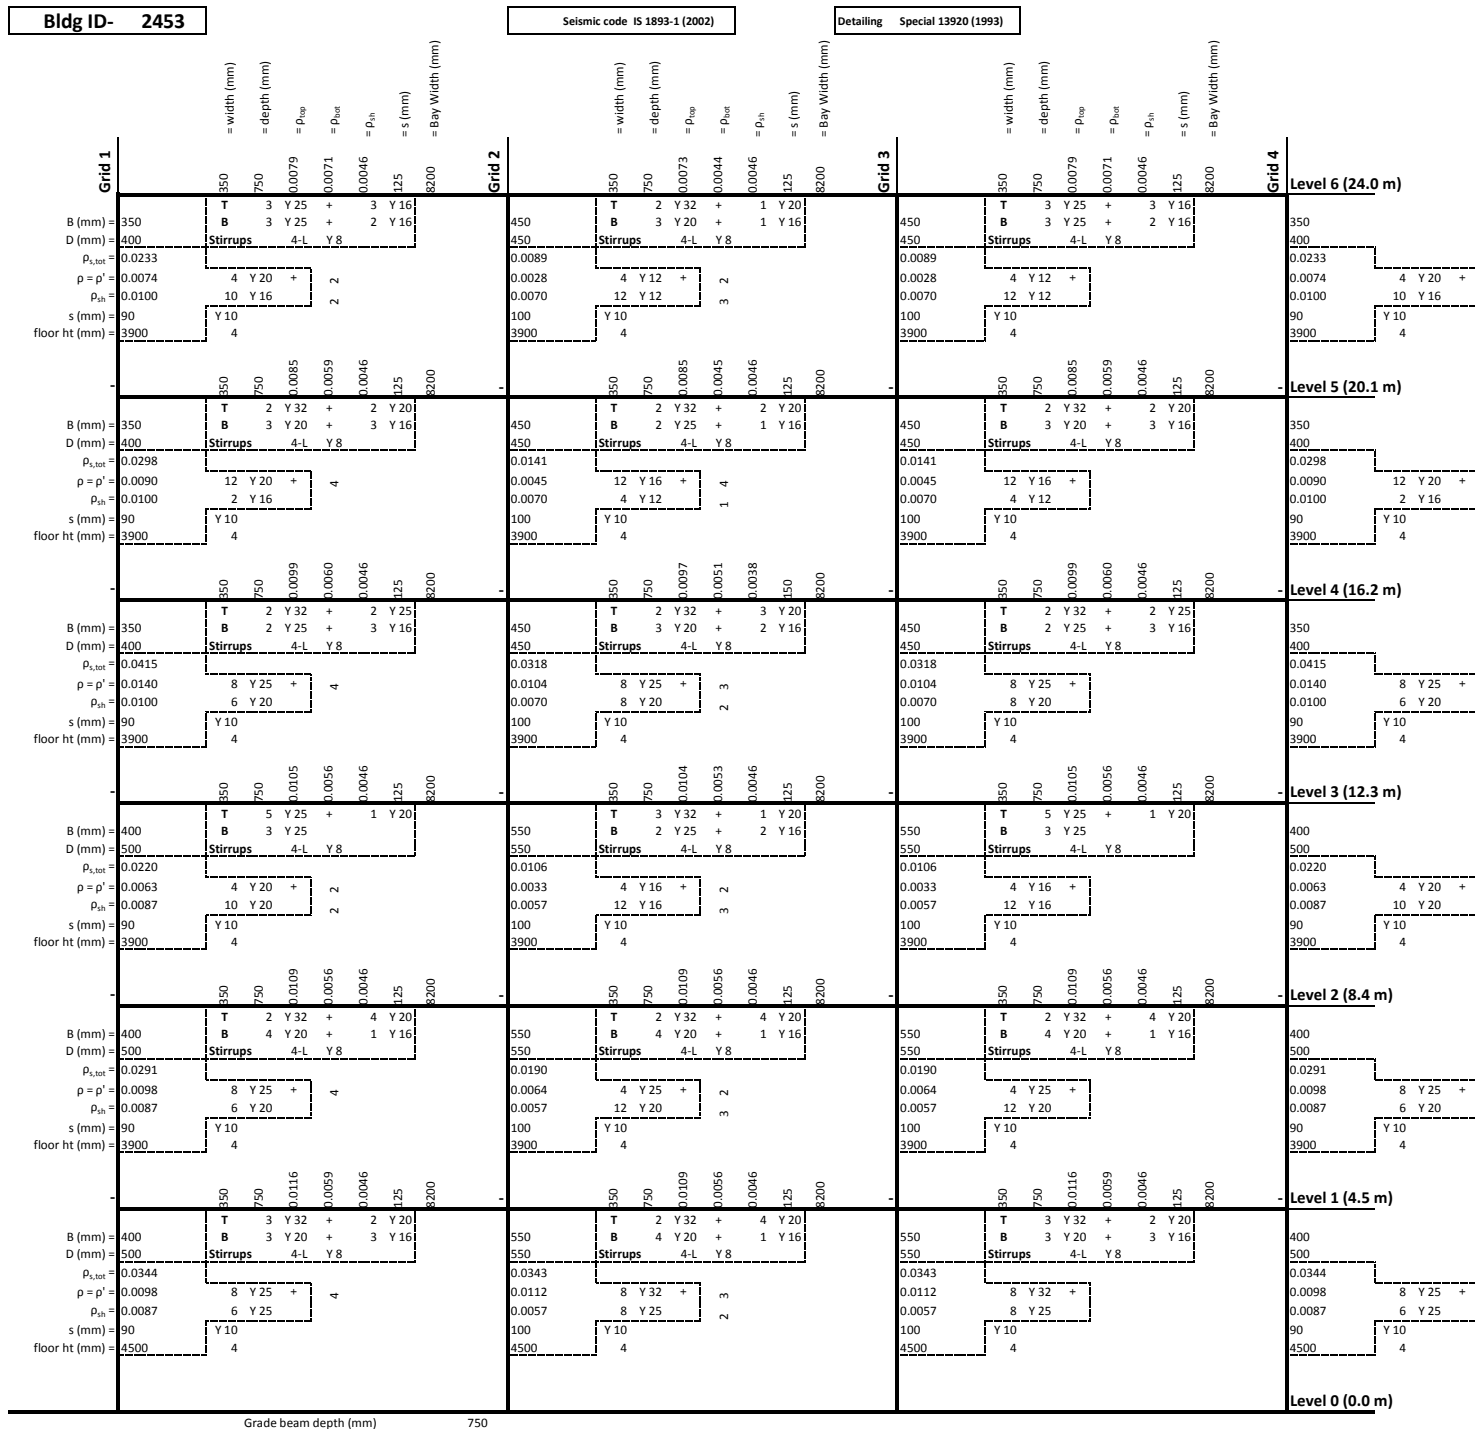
Provided reinforcement and modeling details for building ID 2453
